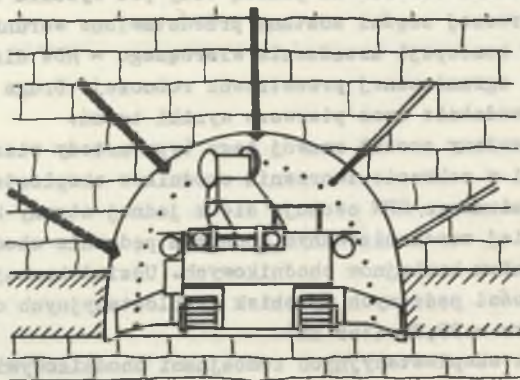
The role of working processes per 1 m of the gallery while drilling with the heading machine
